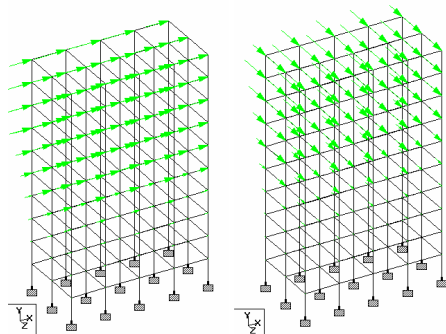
Load application for a Rectangular Plan in Building in X and Z direction
